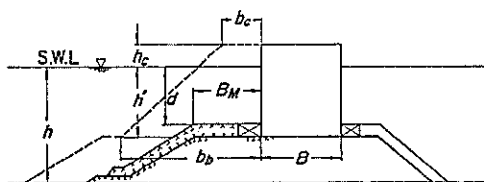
Definition Sketch of Cross Section of Mixed Type Breakwater
